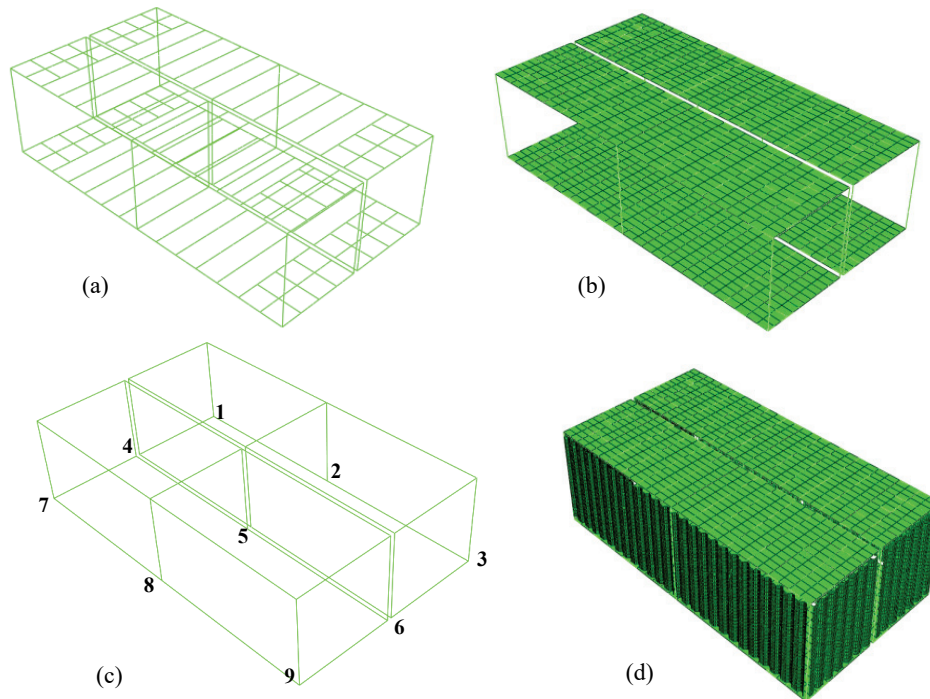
Prototype building FE model (a) beams and columns, (b) floor and roof plates, (c) anchors and (d) whole model
